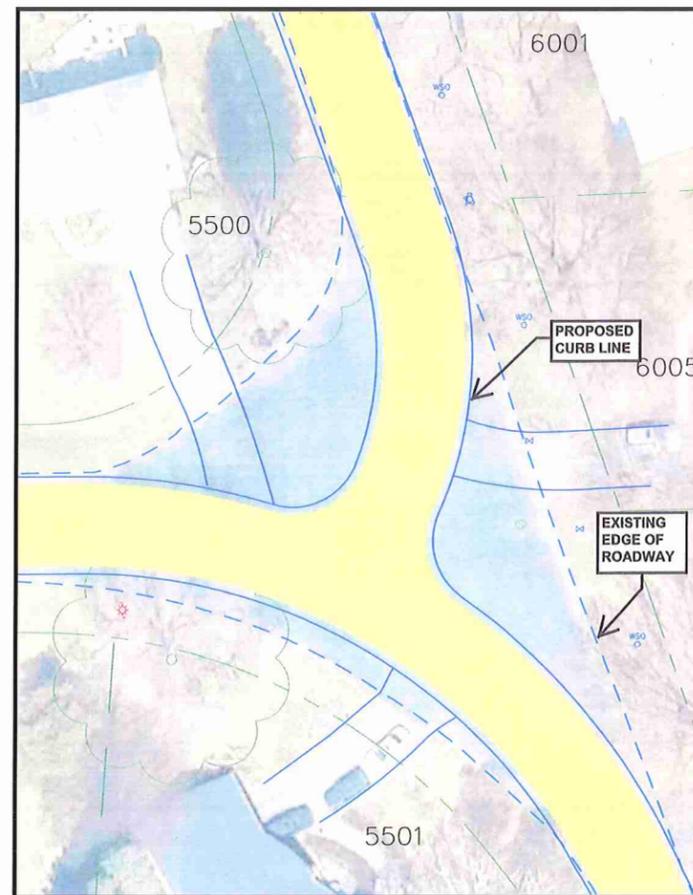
Intersection Detail at Crescent Dr and Highland Rd
